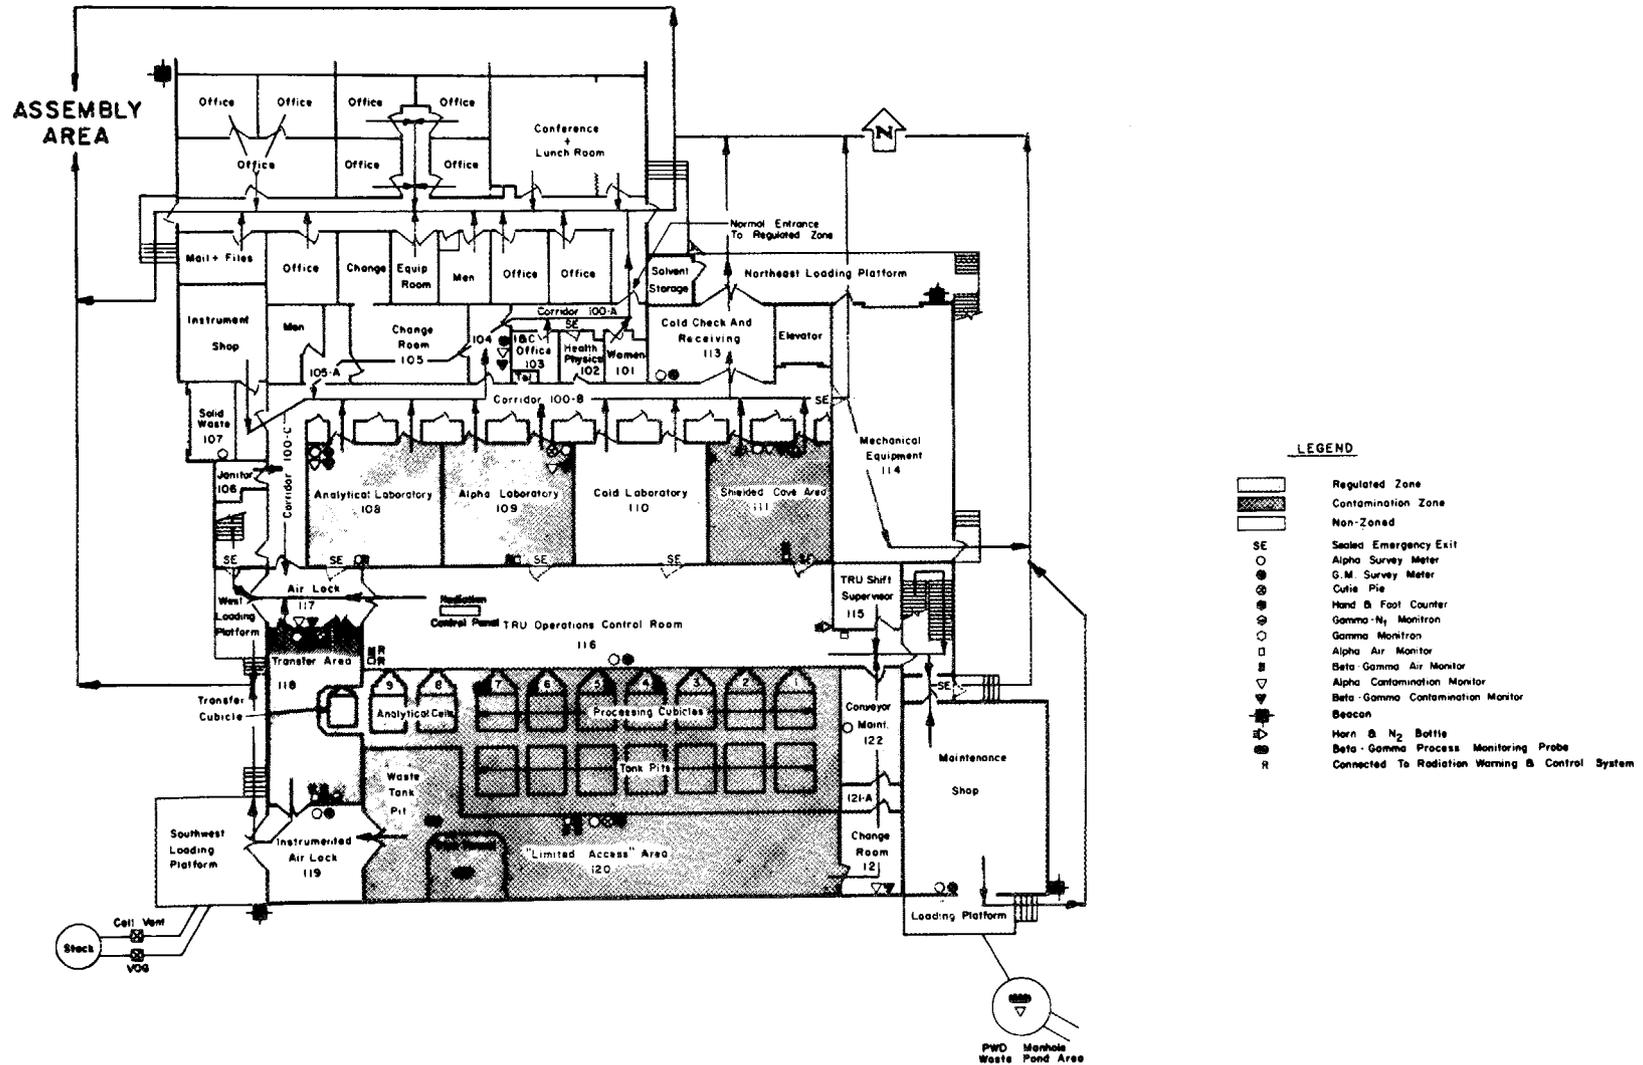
Zoning Plan - First Floor, TRU Facility.
